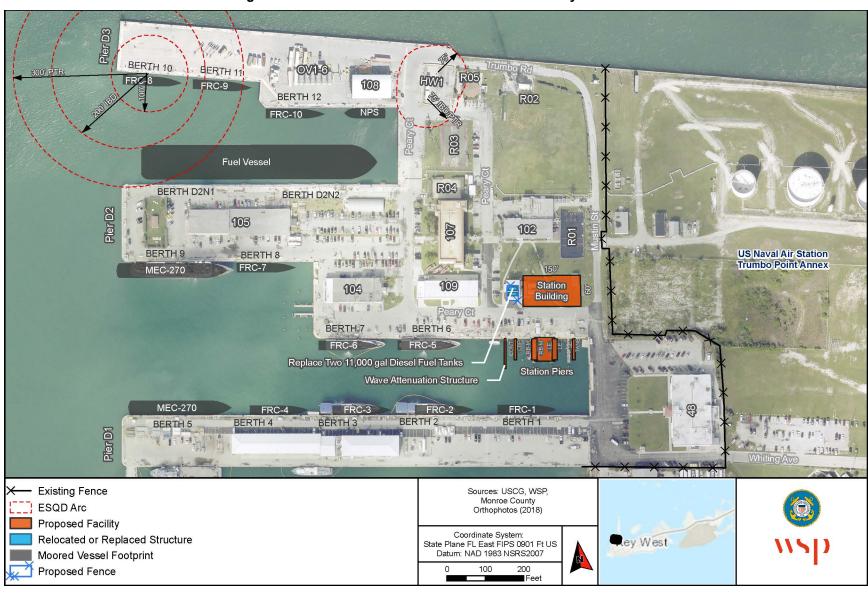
Alternative 3—Station and ANT Facility Site Plan
